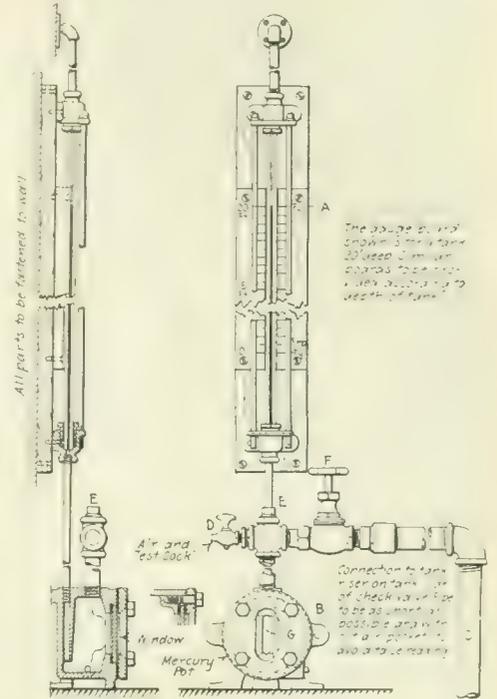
Details of Mercury Gage for Indicating Water Level in Tank.
